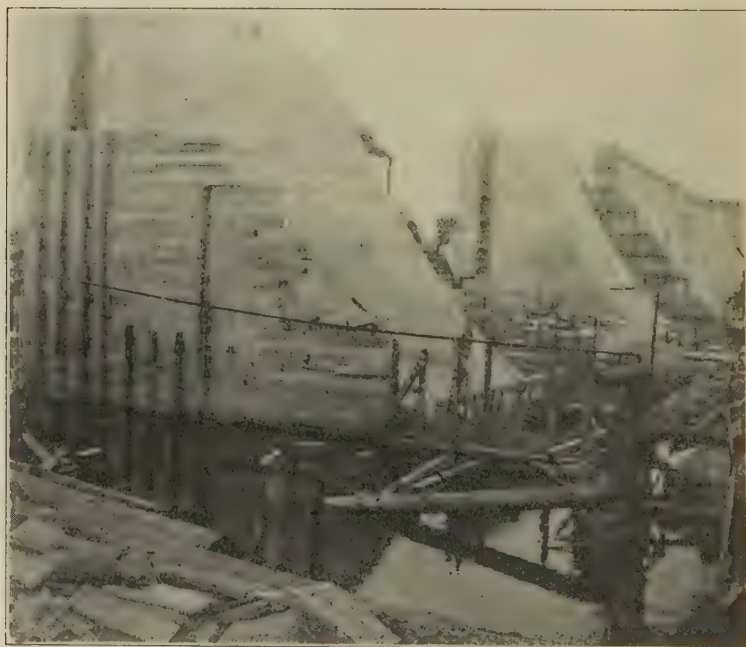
CONSTRUCTION VIEW OF DAM NO. 3.
